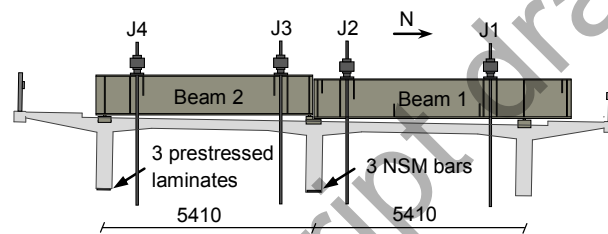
Cross-section and loading setup for the Kiruna Bridge. Hydraulic jacks are denoted J1 - J4.
